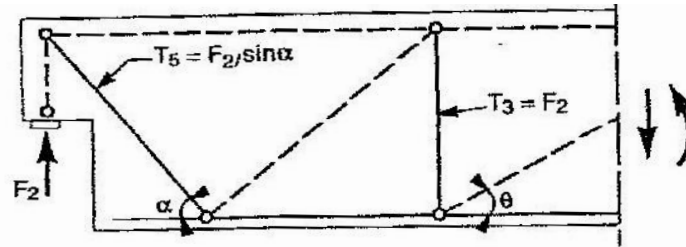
Model with inclined reinforcement at the support[2.5]
